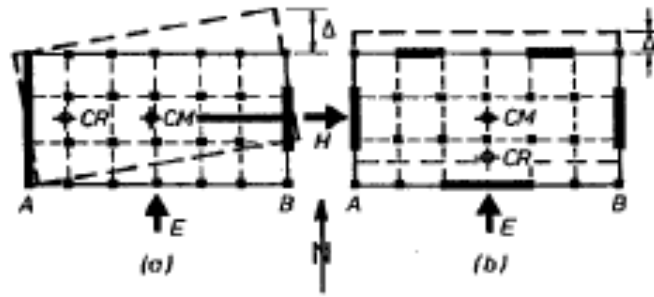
Torsional stability of inelastic wall systems (source: Paulay and Priestley, 1992)
